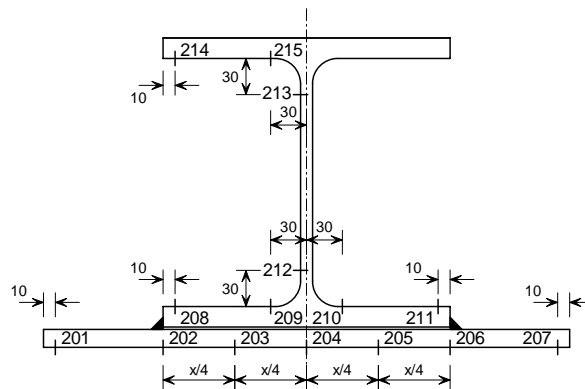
Internal beam transverse arrangement of thermocouples at position A
